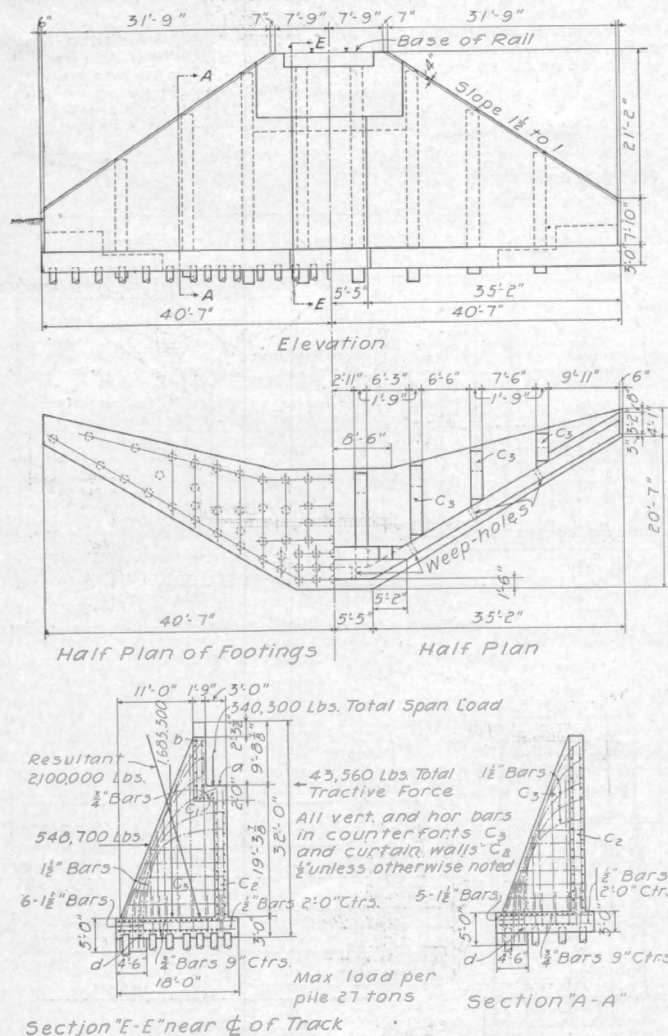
Type C_1 ; Reinforced Concrete Counterfort Abutment.
